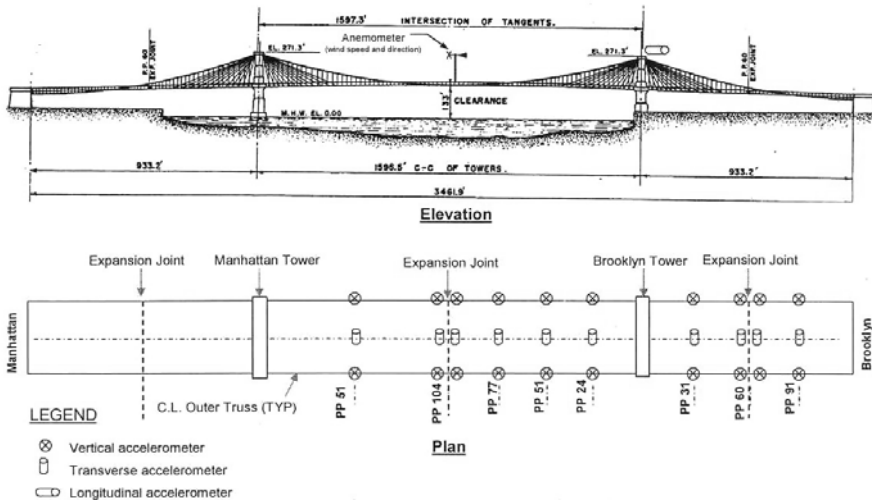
Brooklyn Bridge elevation and plan with sensor locations.
